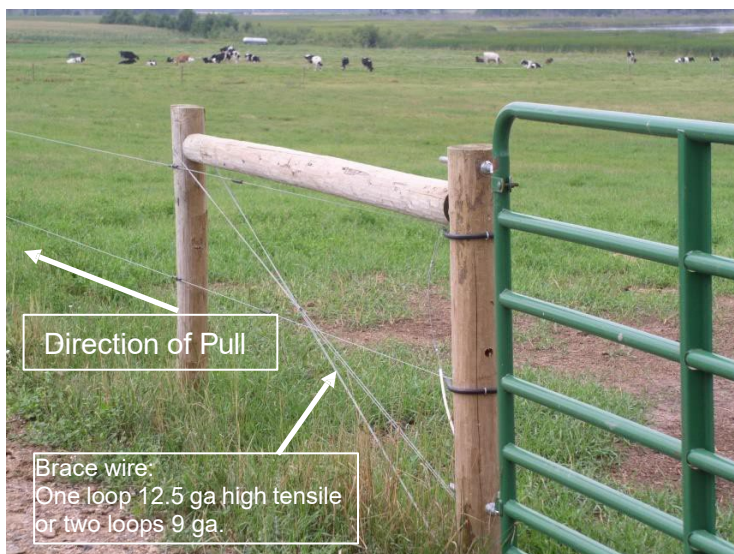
End Brace Assembly. Commonly referred to as an H-Brace style brace. The bottom of the brace wire should always be installed on the end/corner post with the top of the brace wire on top of the post heading in the direction of pull. Standard drawing located on page 6: Drawing Number MN-ECS-021.
